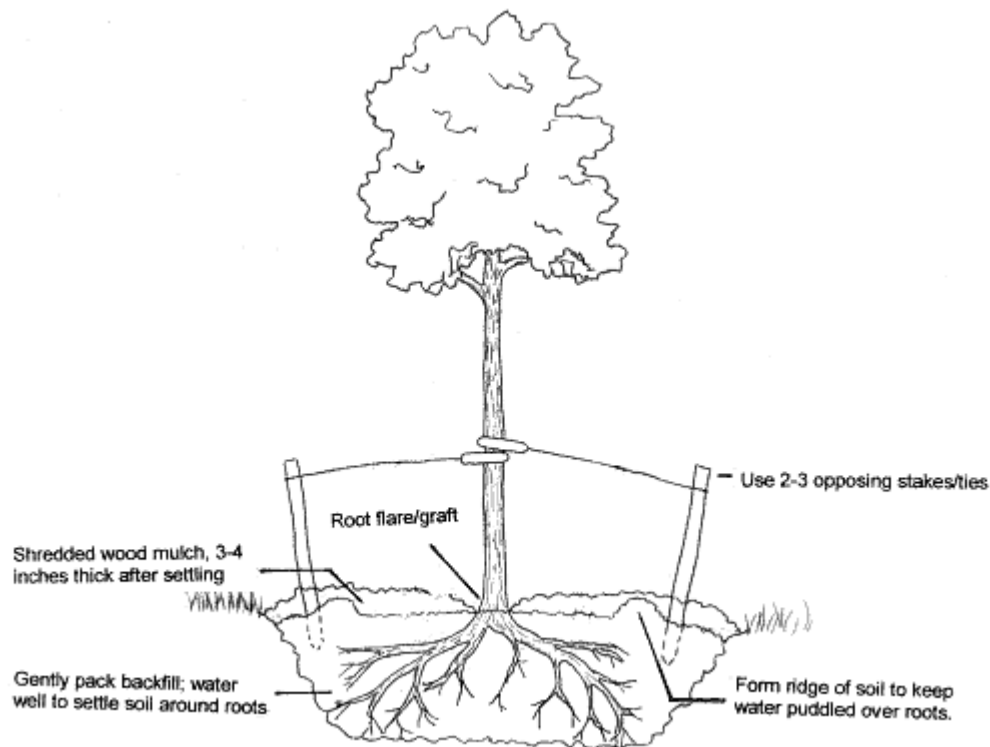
How to plant a bare root tree. Figure from the University of Minnesota Extension. See the city standard detail for planting trees for additional details.
